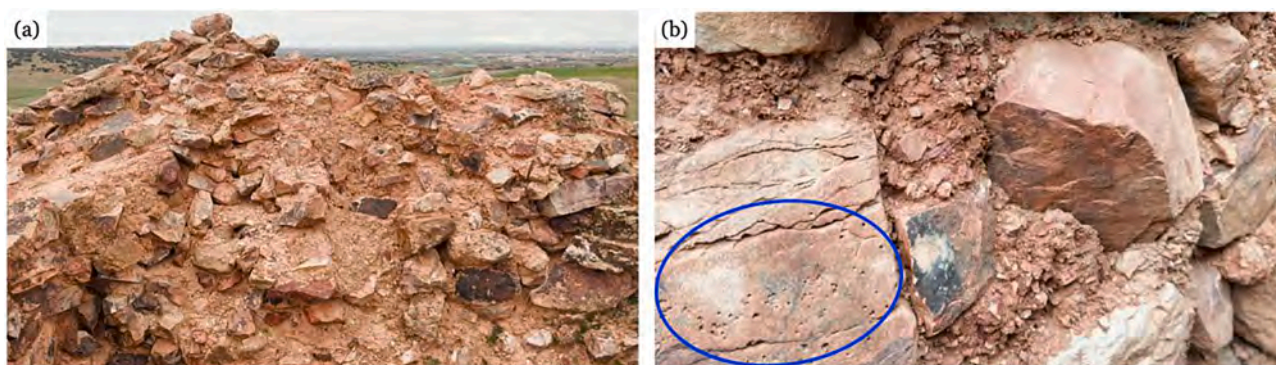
Representative sampling of earth-based mortars from selected masonry joints in the monument: (a) upper section of the tumulus; (b) earth mortar or earthen concrete used as a bonding material within the masonry (detail showing tool marks on worked stone surfaces, highlighted within the blue oval).
